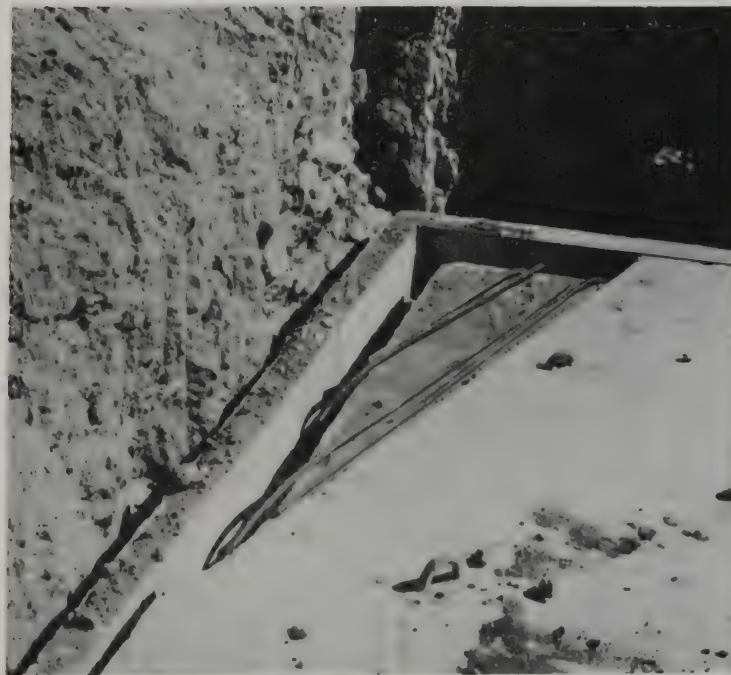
DETAIL OF CORNER OF FULL SIZE SLAB
